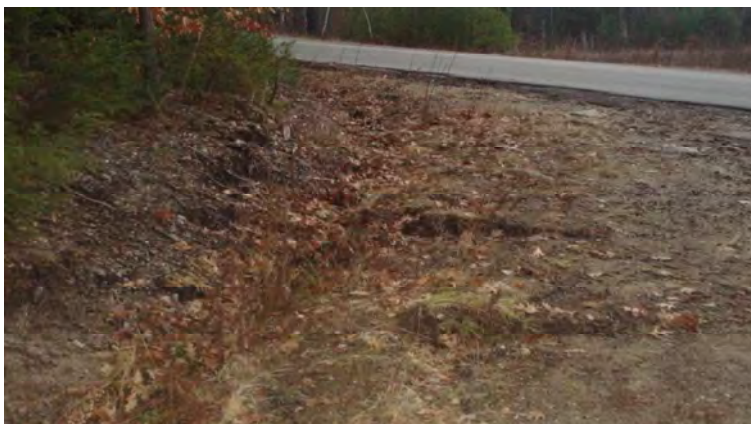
Woodman Road, Proposed Bioretention Basin Location (BMP 31)
